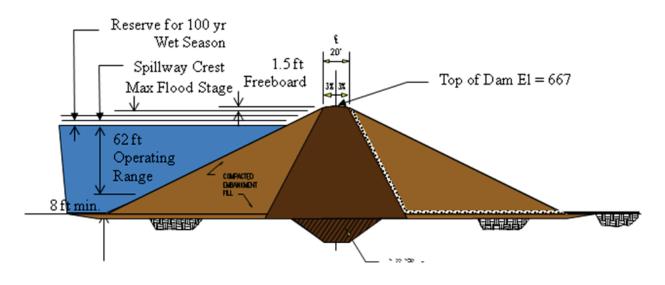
Typical Cross-Section of the Embankment for the Deer Creek
